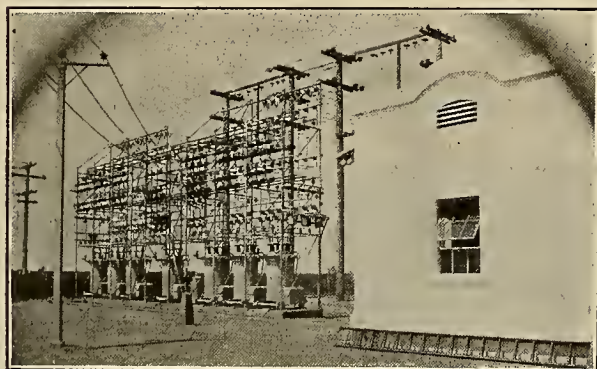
11-kv. switch structure; station building at the right, Le Grand substation.
